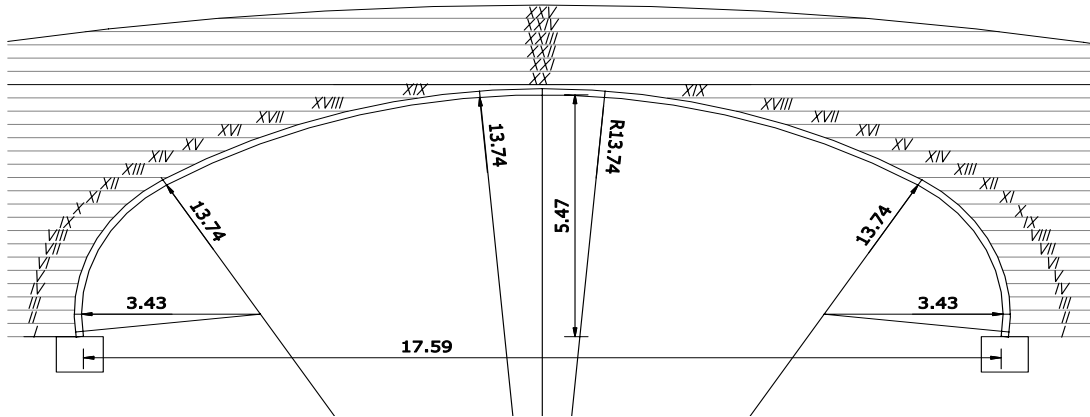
Basic dimensions of SuperCor SC-57S structure and details of backfill layers
